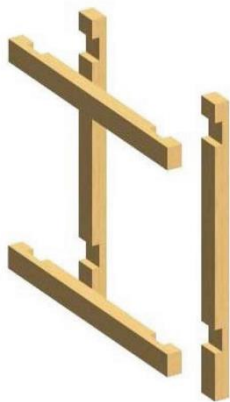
Detail of Cross Halving Joint for pombalino buildings [18]
